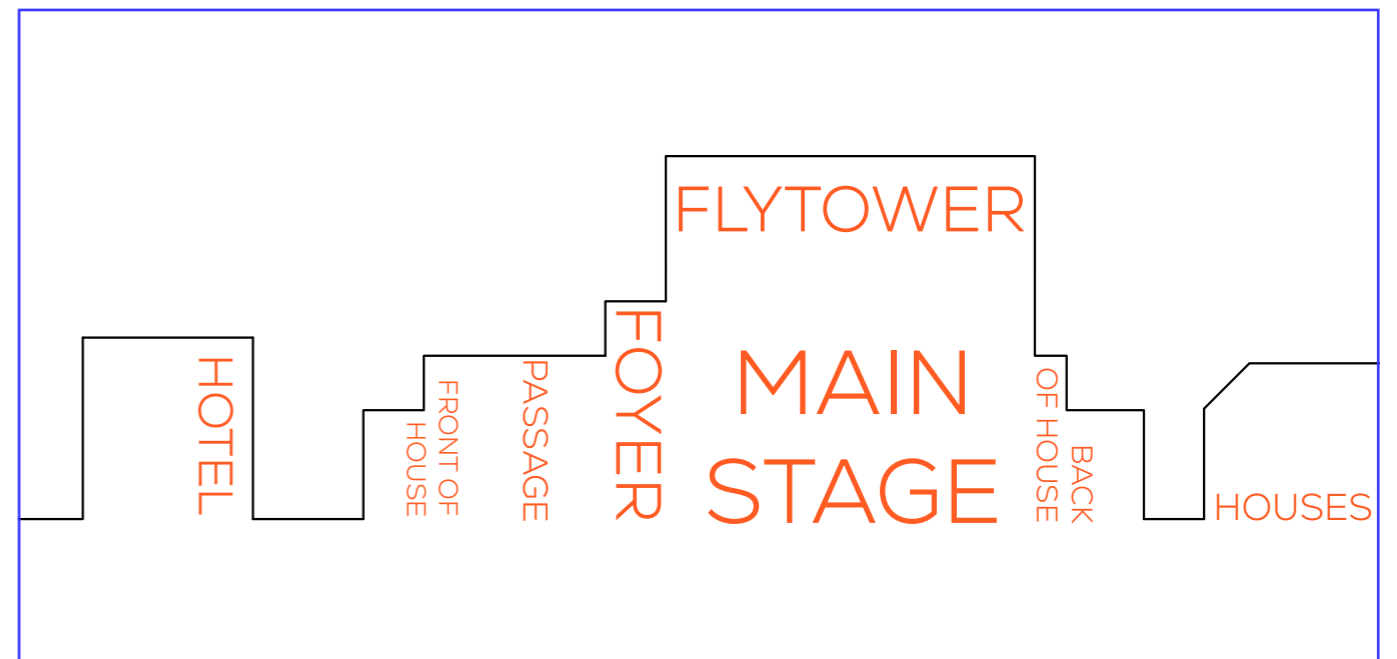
Section diagram showing hight of building and surrounding, scale 1:500
